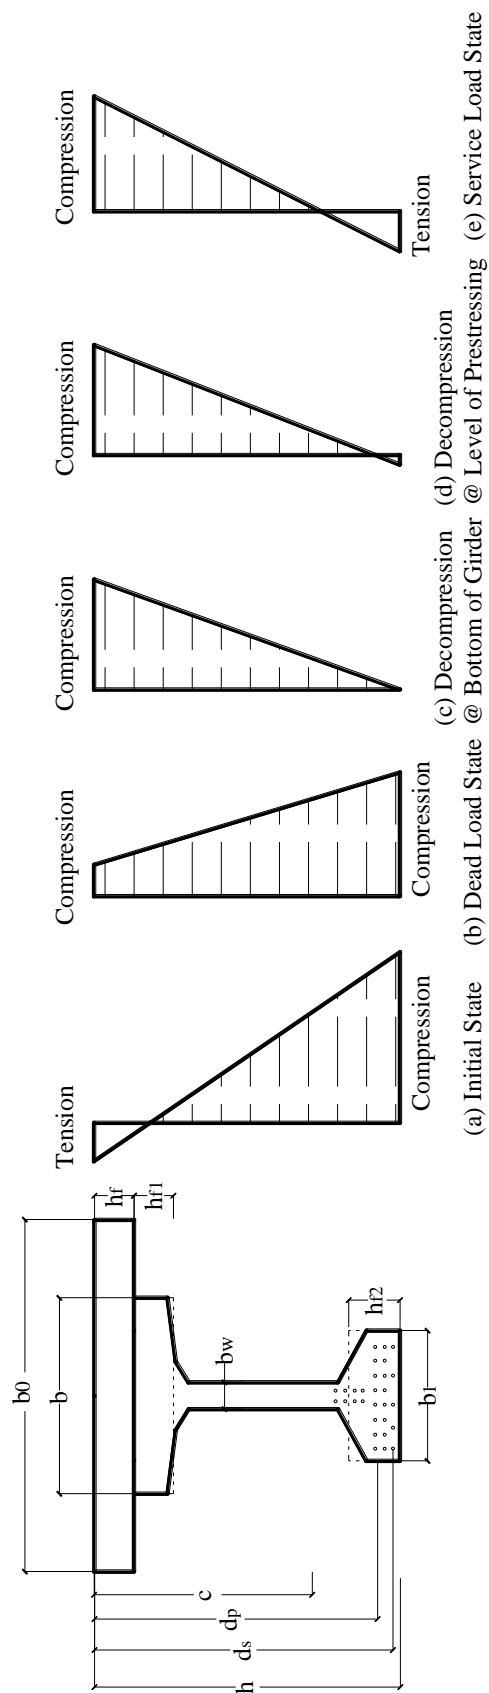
Stress Distribution Diagrams for a Typical Prestressed Concrete Bridge Girder at Various Stages of Loading
